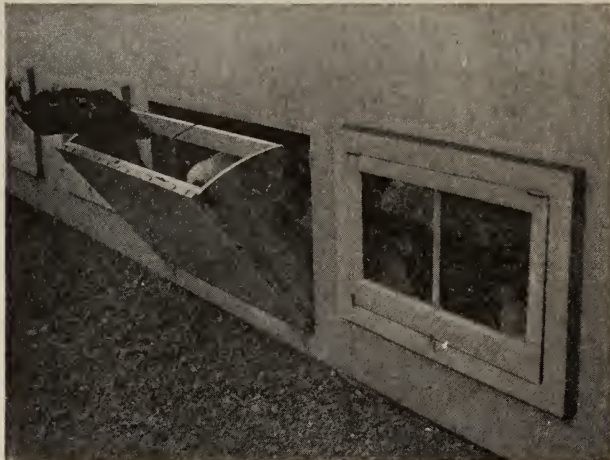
Tip out style of wall hopper for green feed installed in rear wall of a long laying house.
